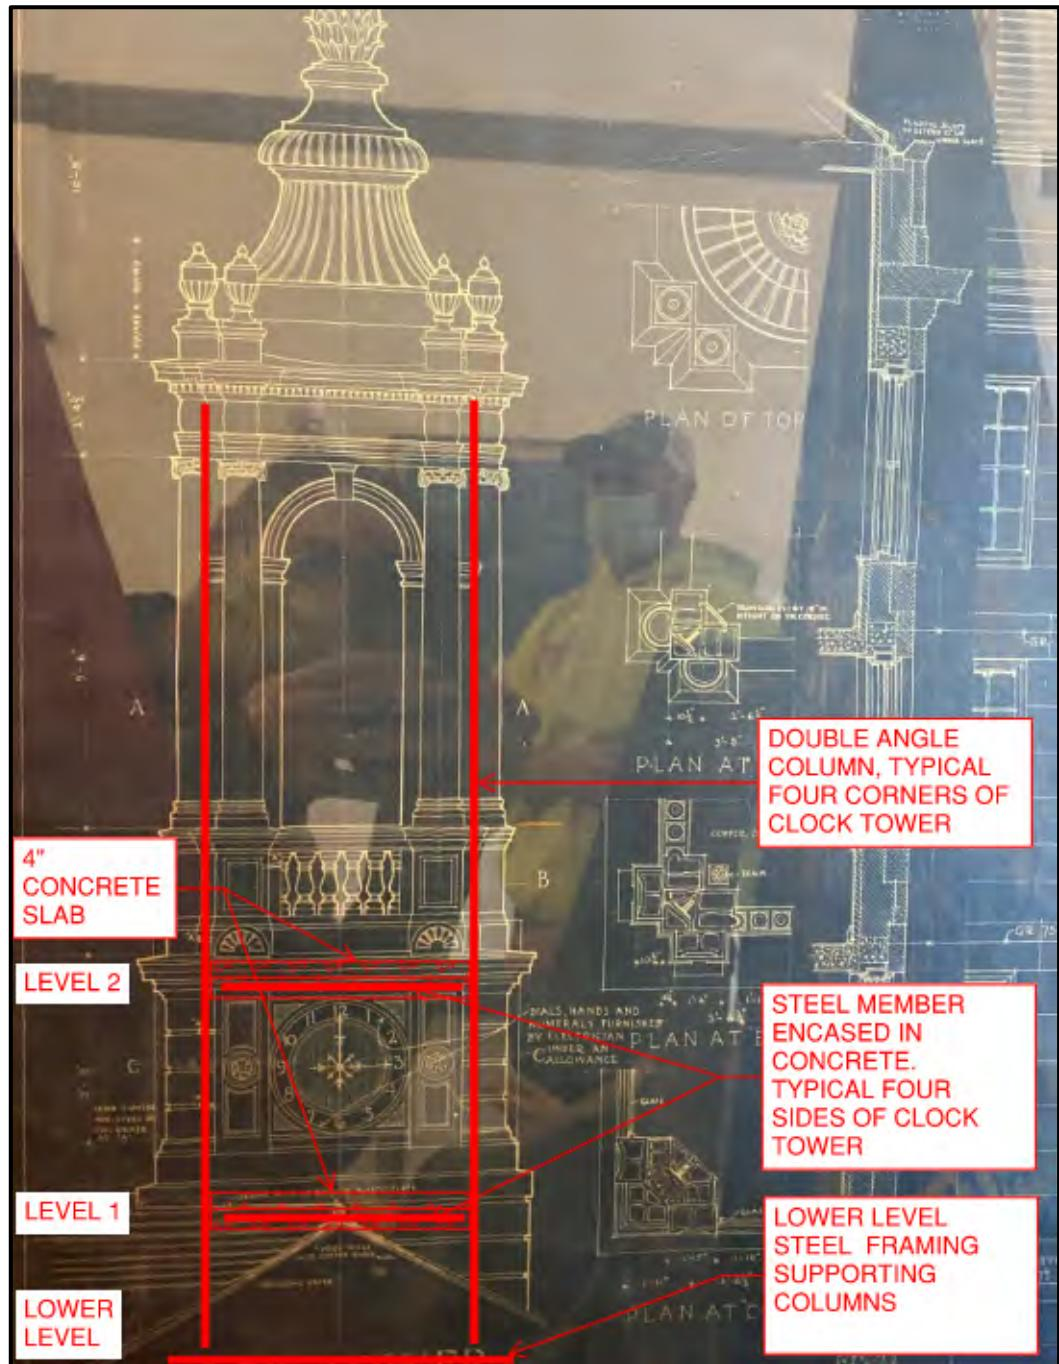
Structure within the clock tower overlaid on a photo of an existing architectural drawing.
